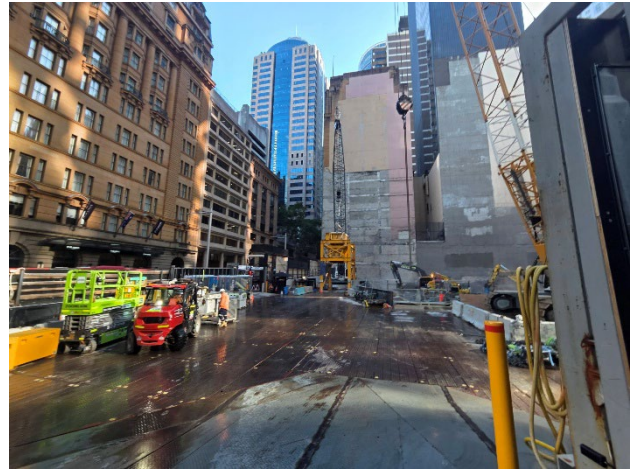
Hunter Street East: Works on the completed steel deck.
